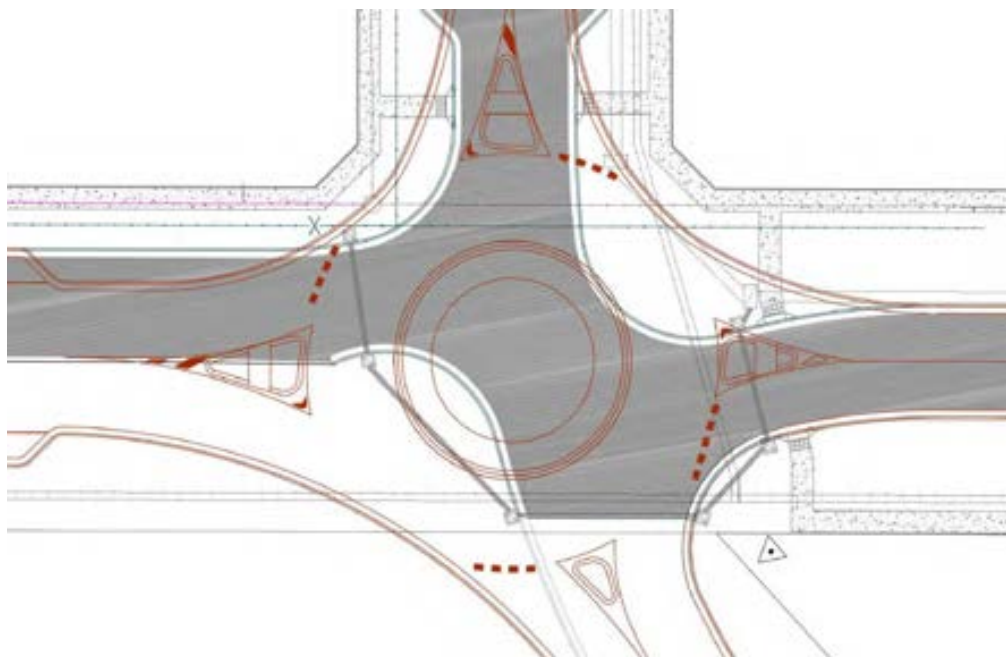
initial functional layout plan for DI\_RD\_31d/Settlers Drive intersection.
